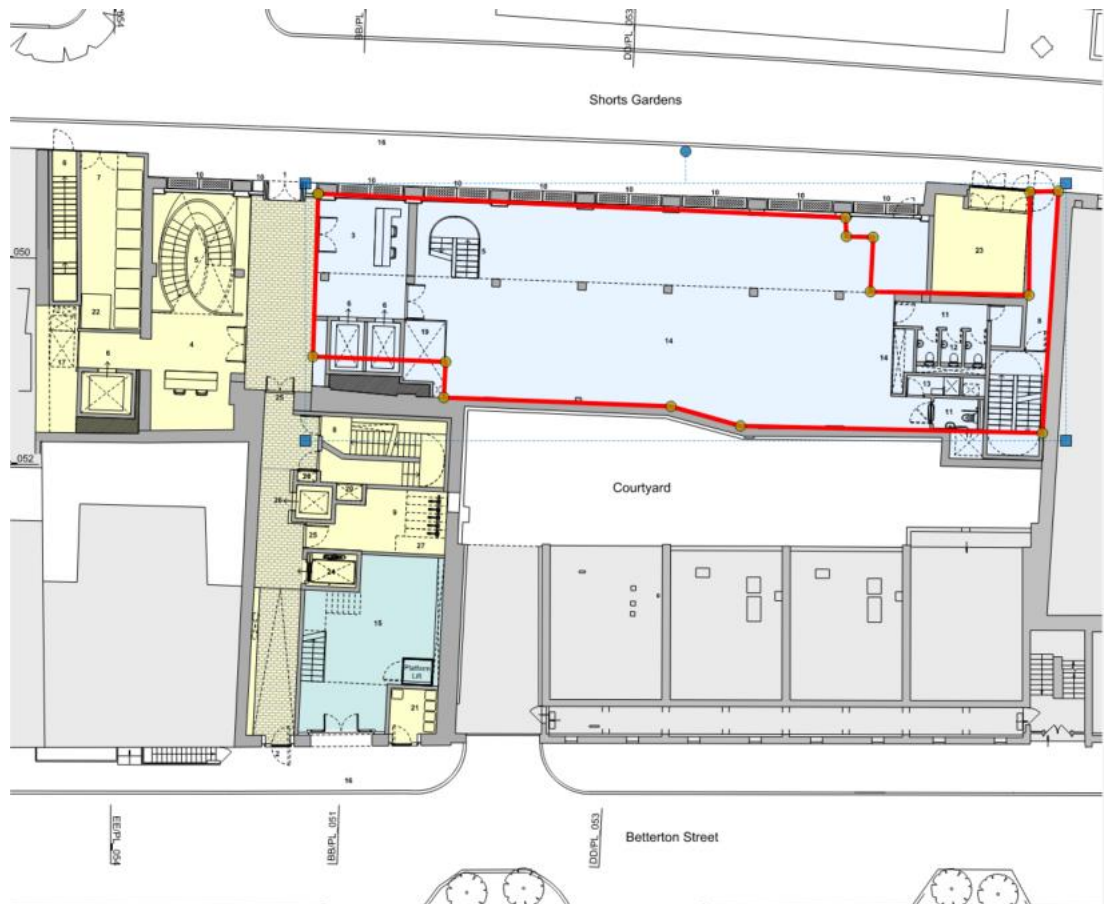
(above): The area outlined in red shows the extent of the ground floor element of the current planning application within the wider context of the Ground floor plan approved as part of the 2019 planning permission.
